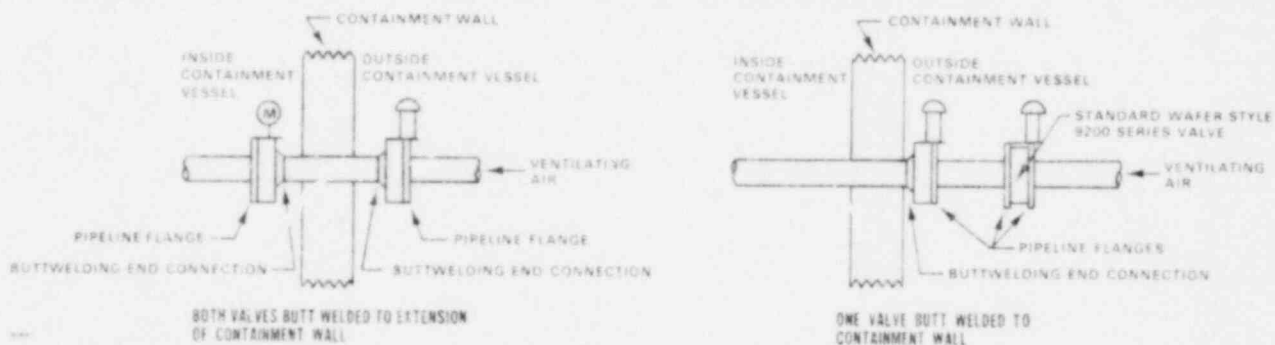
Typical Installations for Single-Flange 9200 Series Valves with One Butt-Welding-End Connection and One Flanged Connection (Being Used as Isolation Containment Valves in Ventilating Air System)
